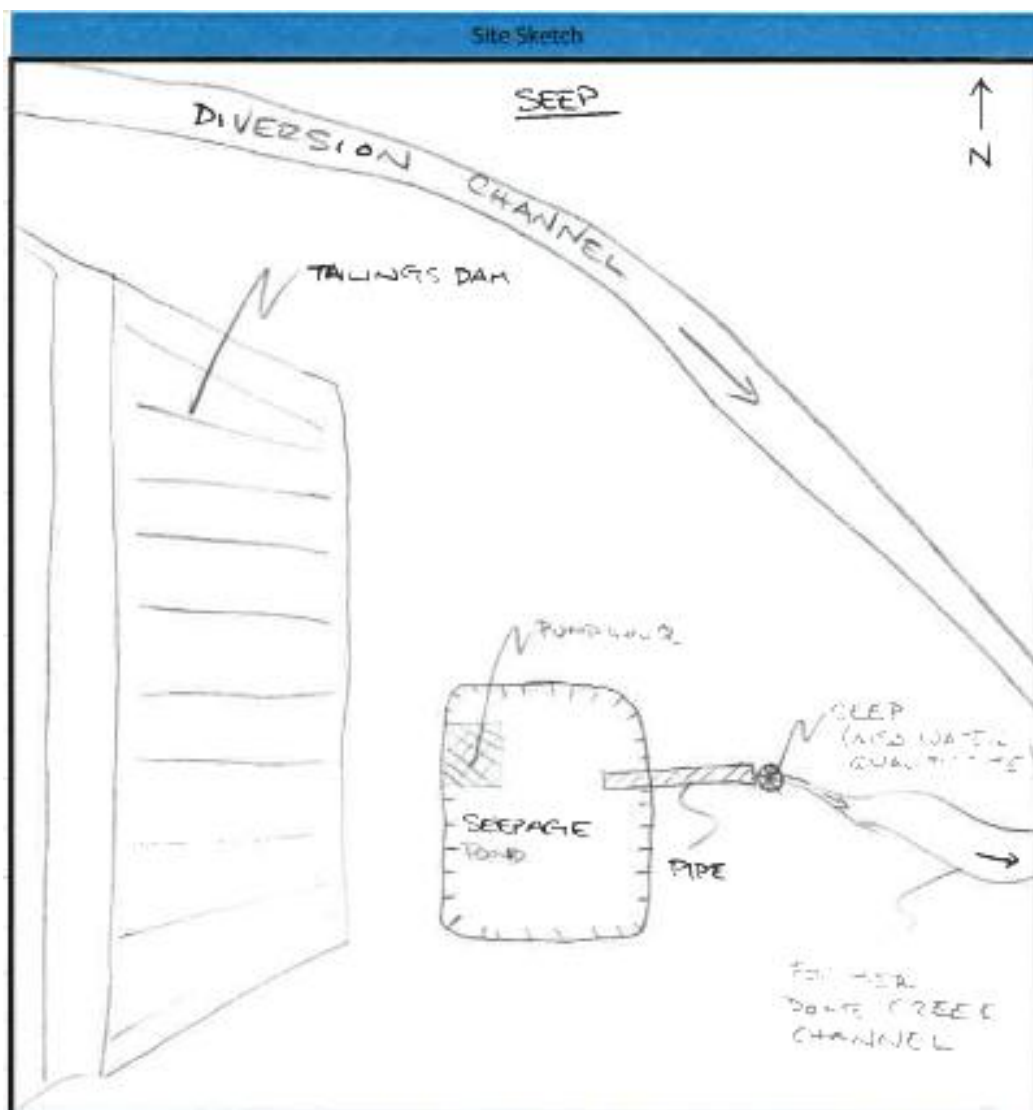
Seepage Site (H-SEEP) - August 18, 2011.
